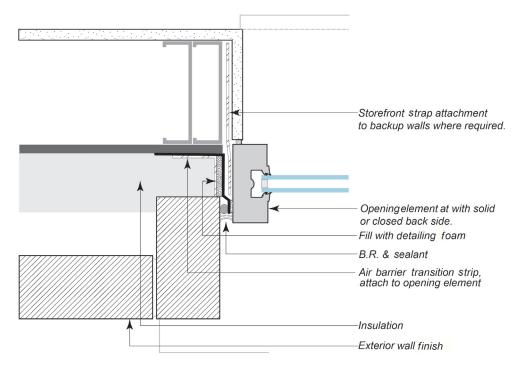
(EN51) Top view of a window system to opaque wall connection.
